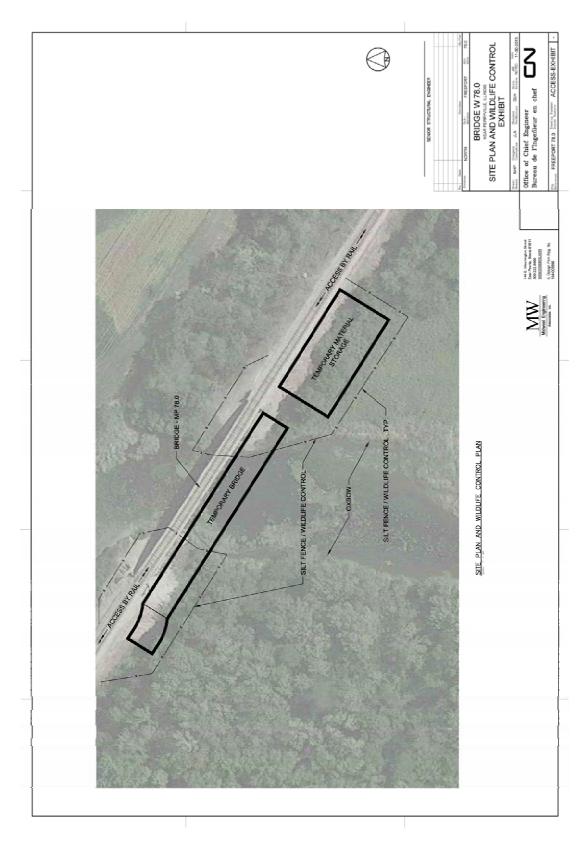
Locations of temporary bridge, staging area to be used for temporary storage, and access route to the construction zone.
